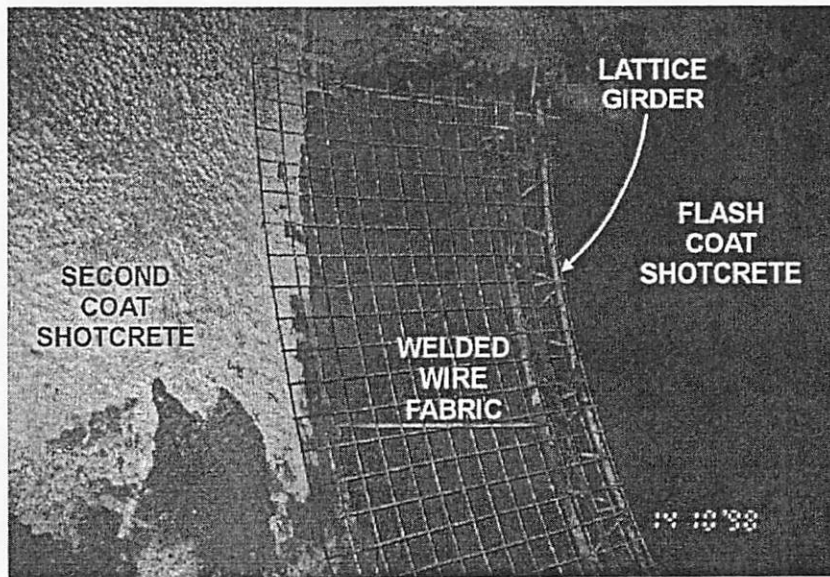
Lattice Girder and Mesh Reinforced Shotcrete Lining
